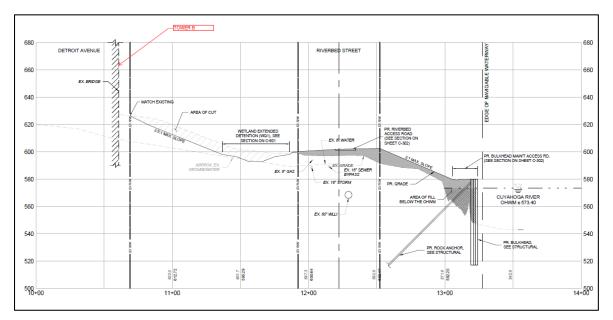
A – IRISHTOWN BEND PROJECT - RETAINING WALL AND DEEP FOUNDATION IMPROVMENTS ADJACENT TO TOWER B
